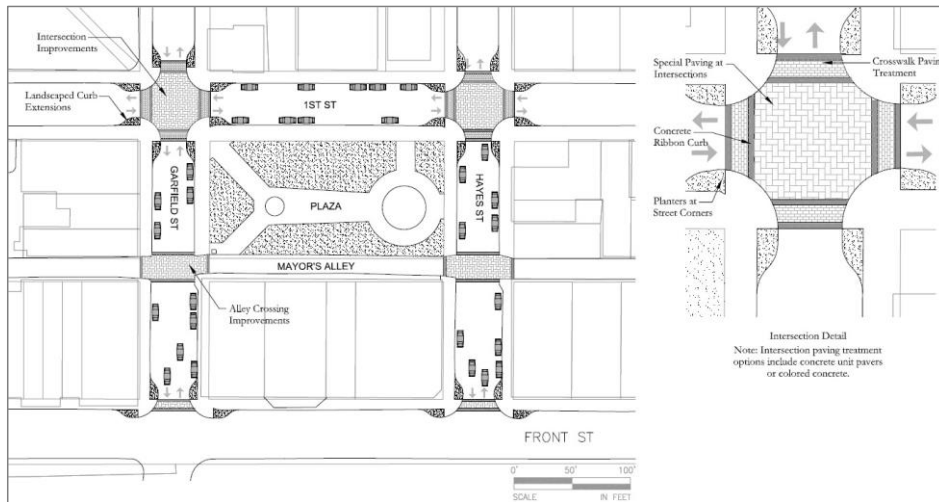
L-01N – Plaza Street Plan – Two-Way Traffic Concept
